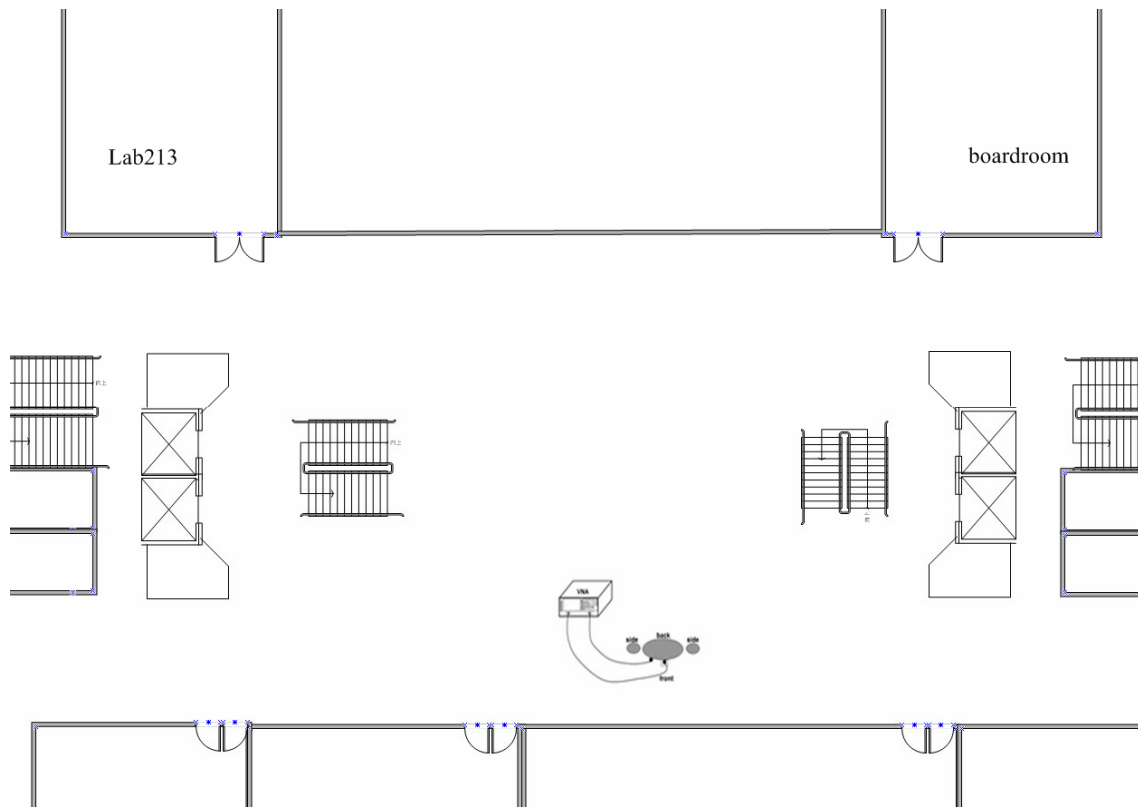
(d) Floor layout of site D (near a wall), which is located at 2nd floor of MISRC.
